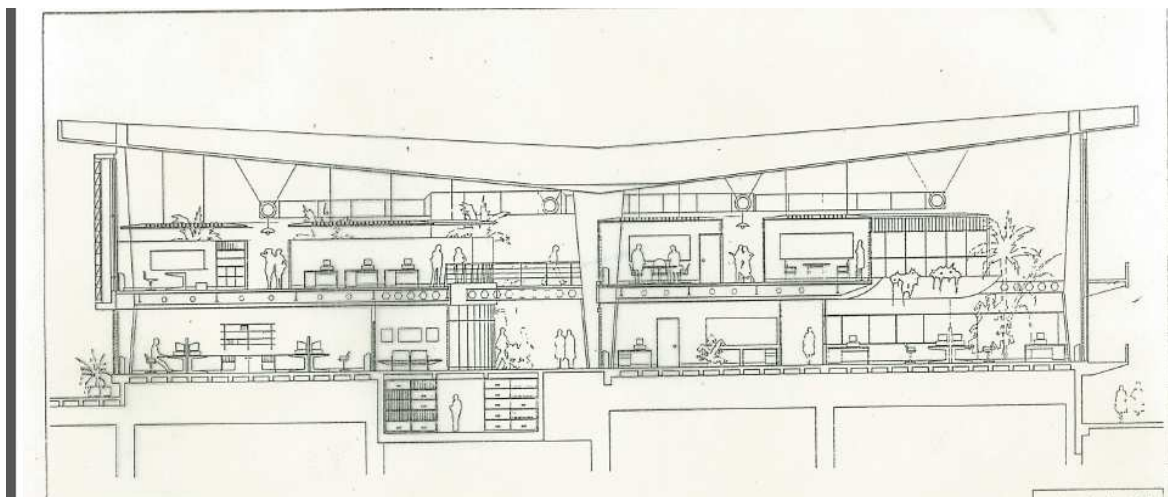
Section of the Ocean Terminal Building showing mezzanine and new offices: Protekon Architects: 1990
